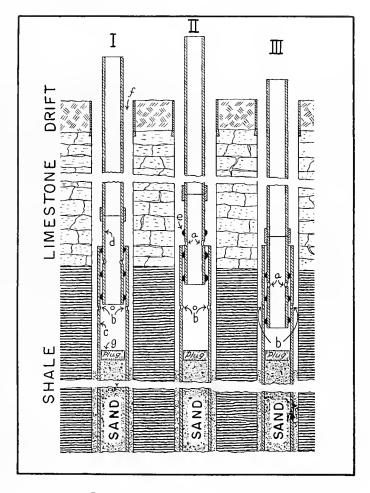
Bottom Hole Casing Connection for Grouting an Old Well.
